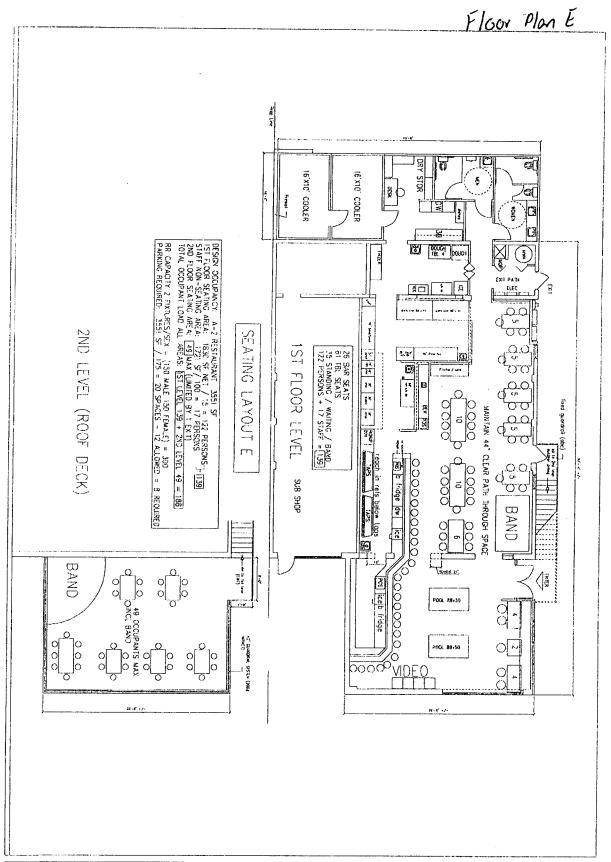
Exhibit A – Floor Plan(s) Worksheet – Floor Plan Entertainment Establishment
